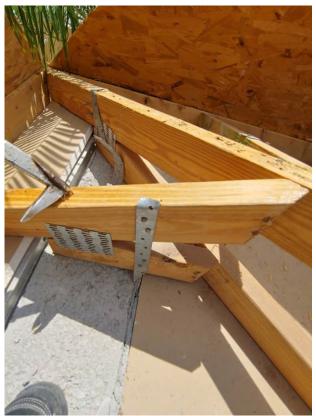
Rotten fascia, truss and plywood sheathing were observed on building 21791.
